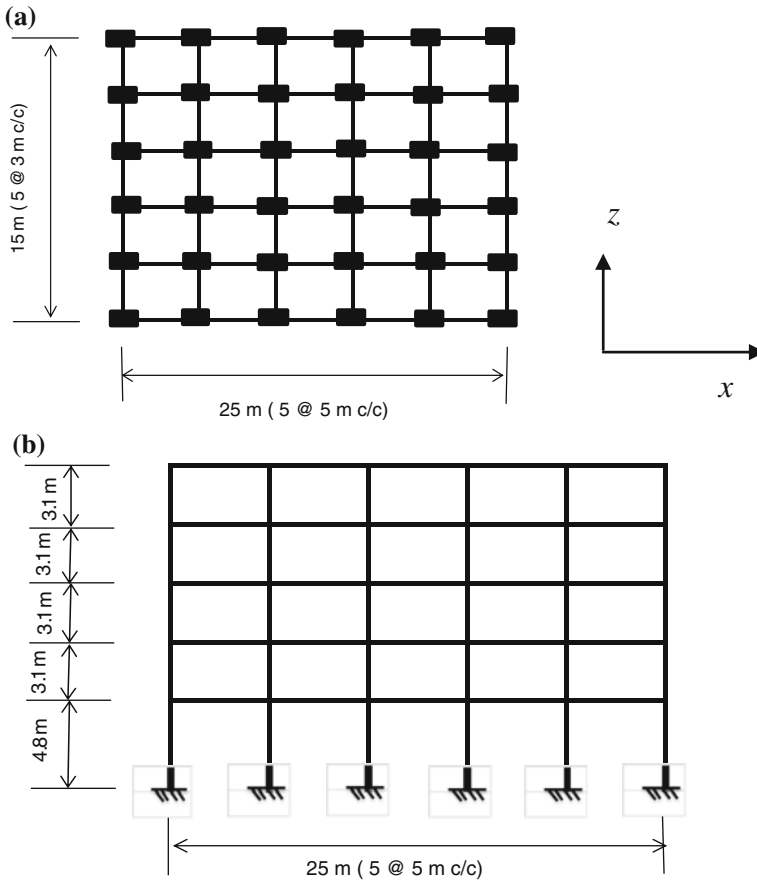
Plan and the elevation of the structure. a Plan, b elevation
